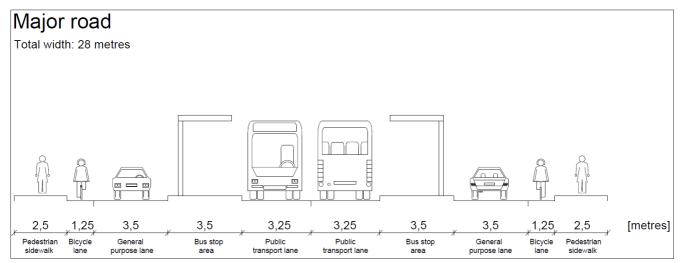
Cross section of the major road. [Figure made in AutoCAD]
